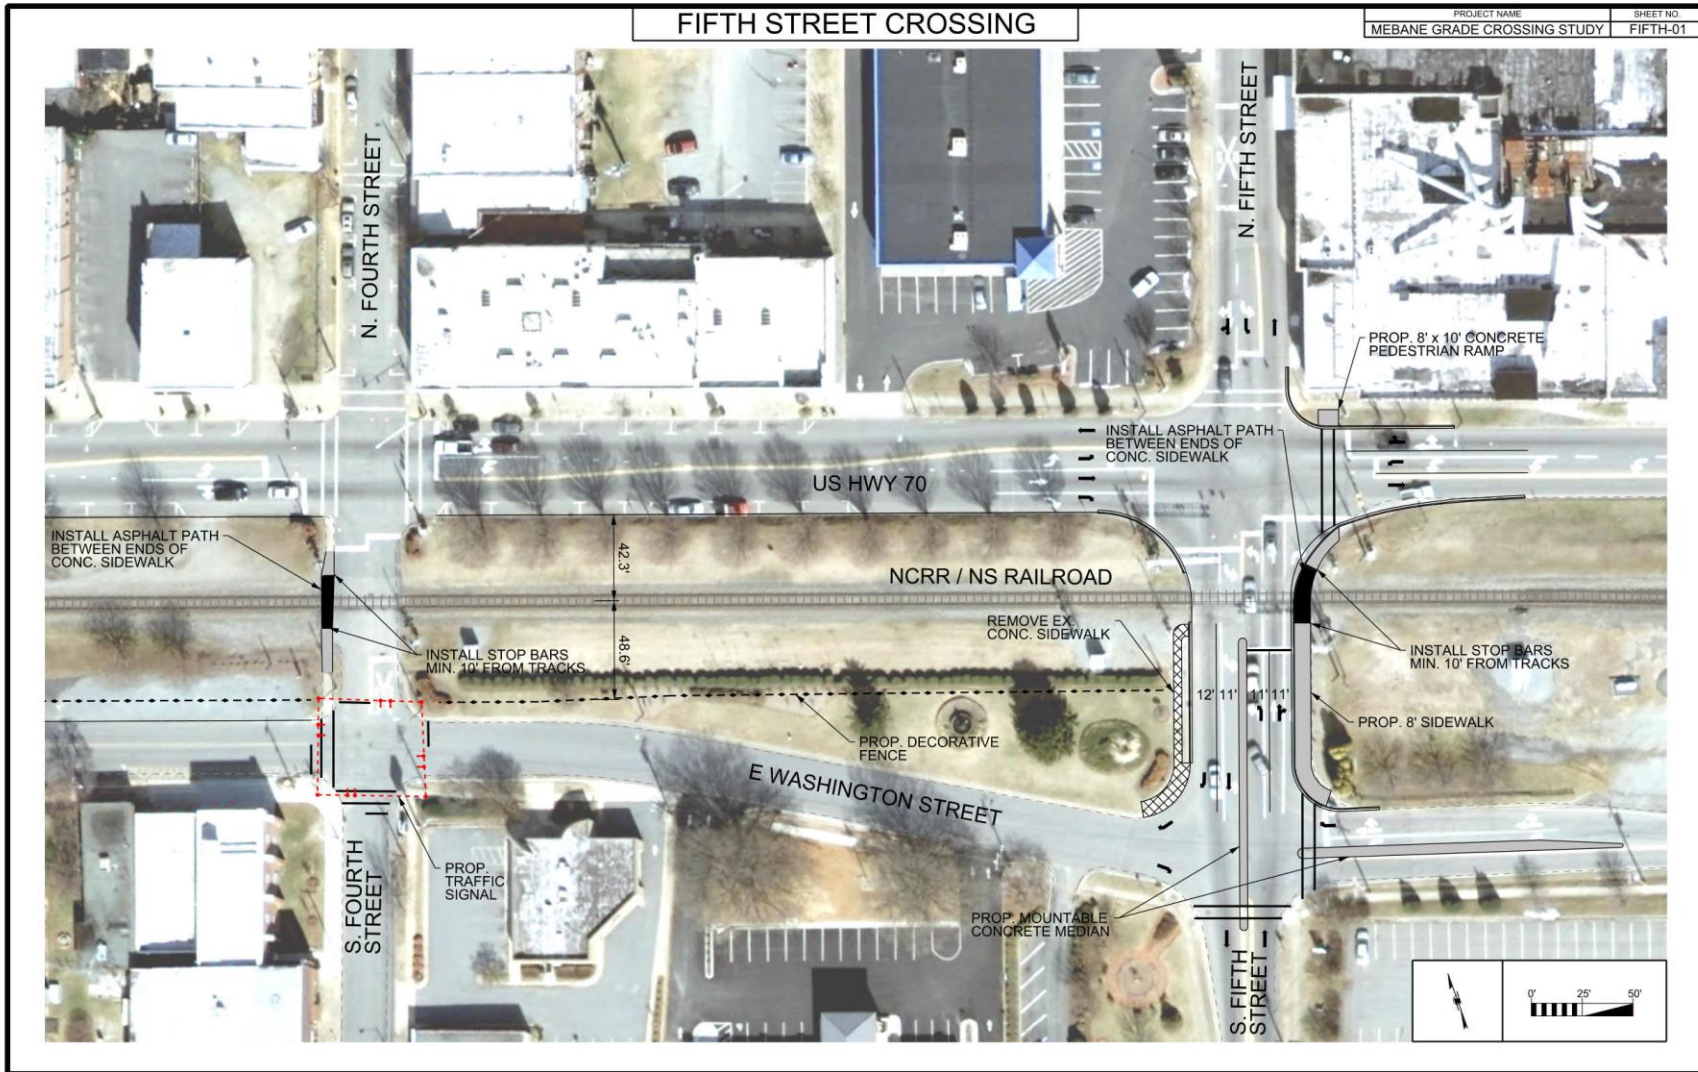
Example of a Mountable Concrete Median that could be installed on 5th Street
